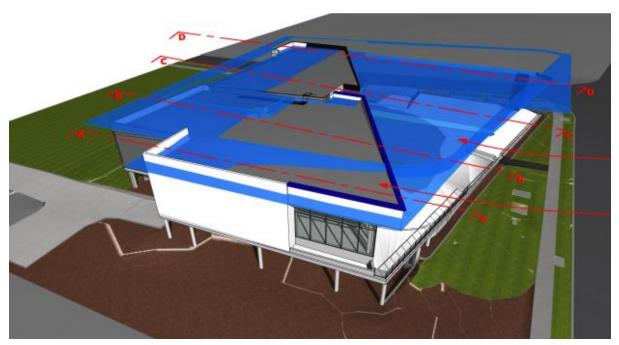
Building height plane looking in a northeastern direction. The blue indicates the 9.5m building height plane. The elements above this plane are shown above the blue plane. Source: Centric Architects Plan 0489-9011 Issue C.
